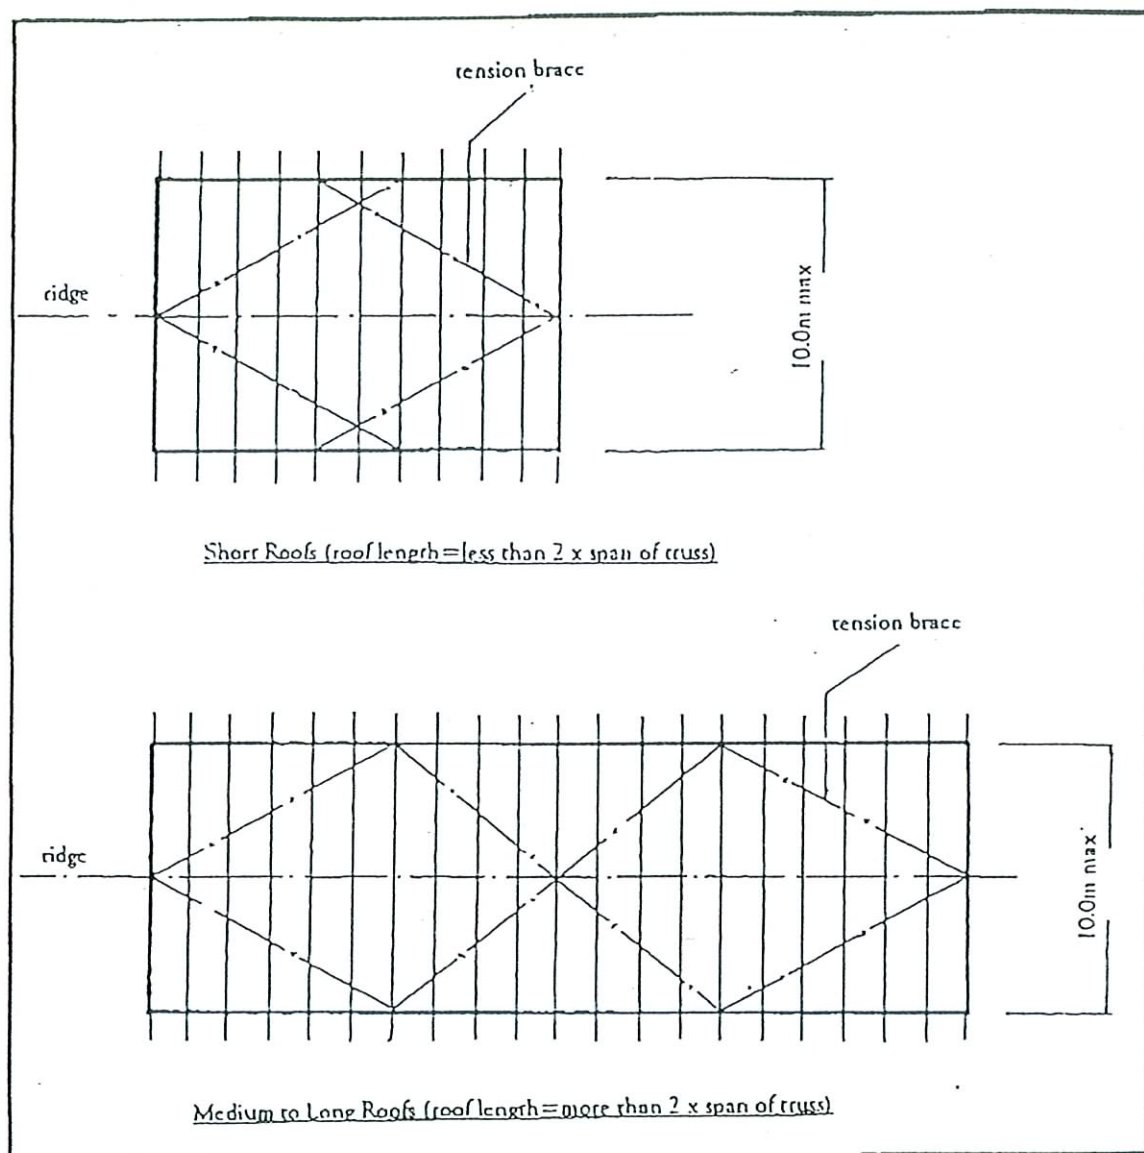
Suggested Roof Bracing Layout (Timber Bracing)
